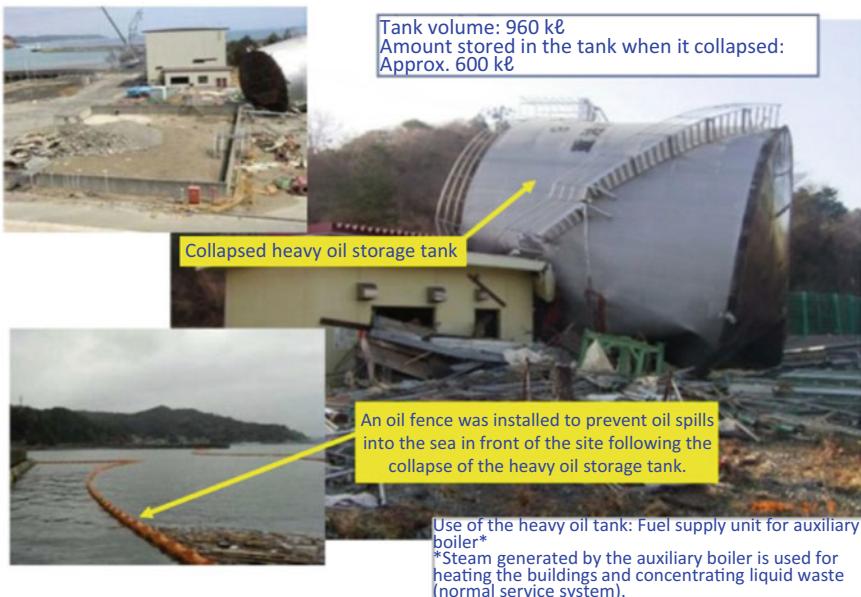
Collapse of the heavy oil tank at Onagawa Unit 1 [9]
